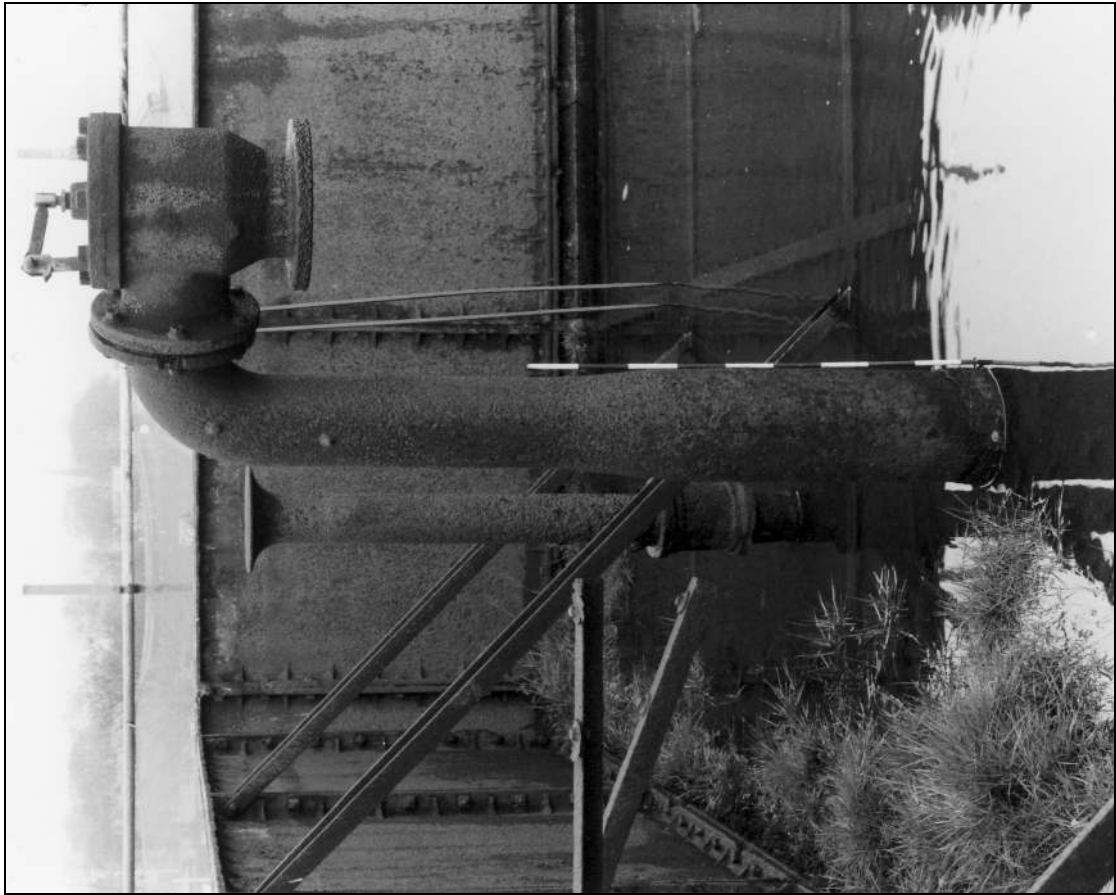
Later feed, and overflow pipes, within tank, from the south (film 6, frame 18)
